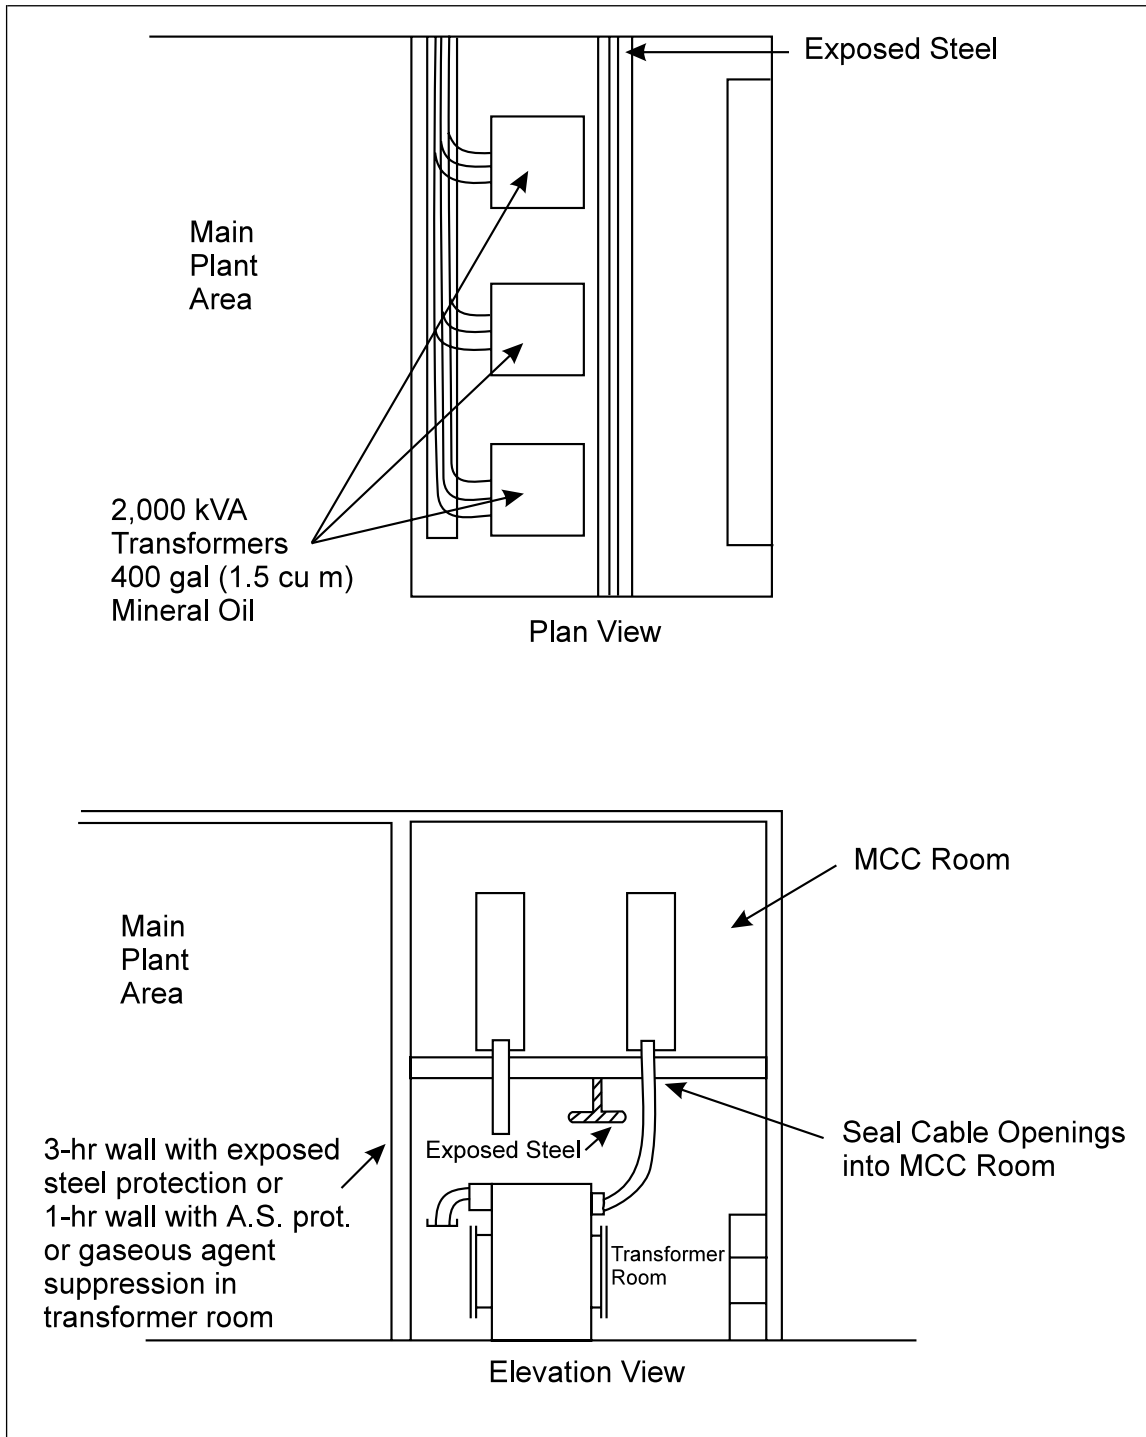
Plan and elevation view of transformer room and MCC room containing three mineral oil insulated transformers.
